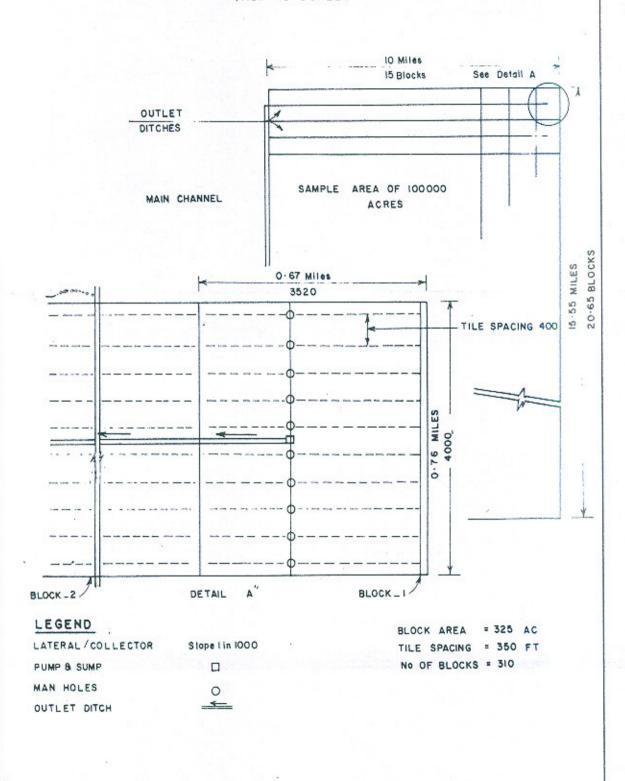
LAYOUT OF A TYPICAL TILE DRAINAGE SYSTEM
